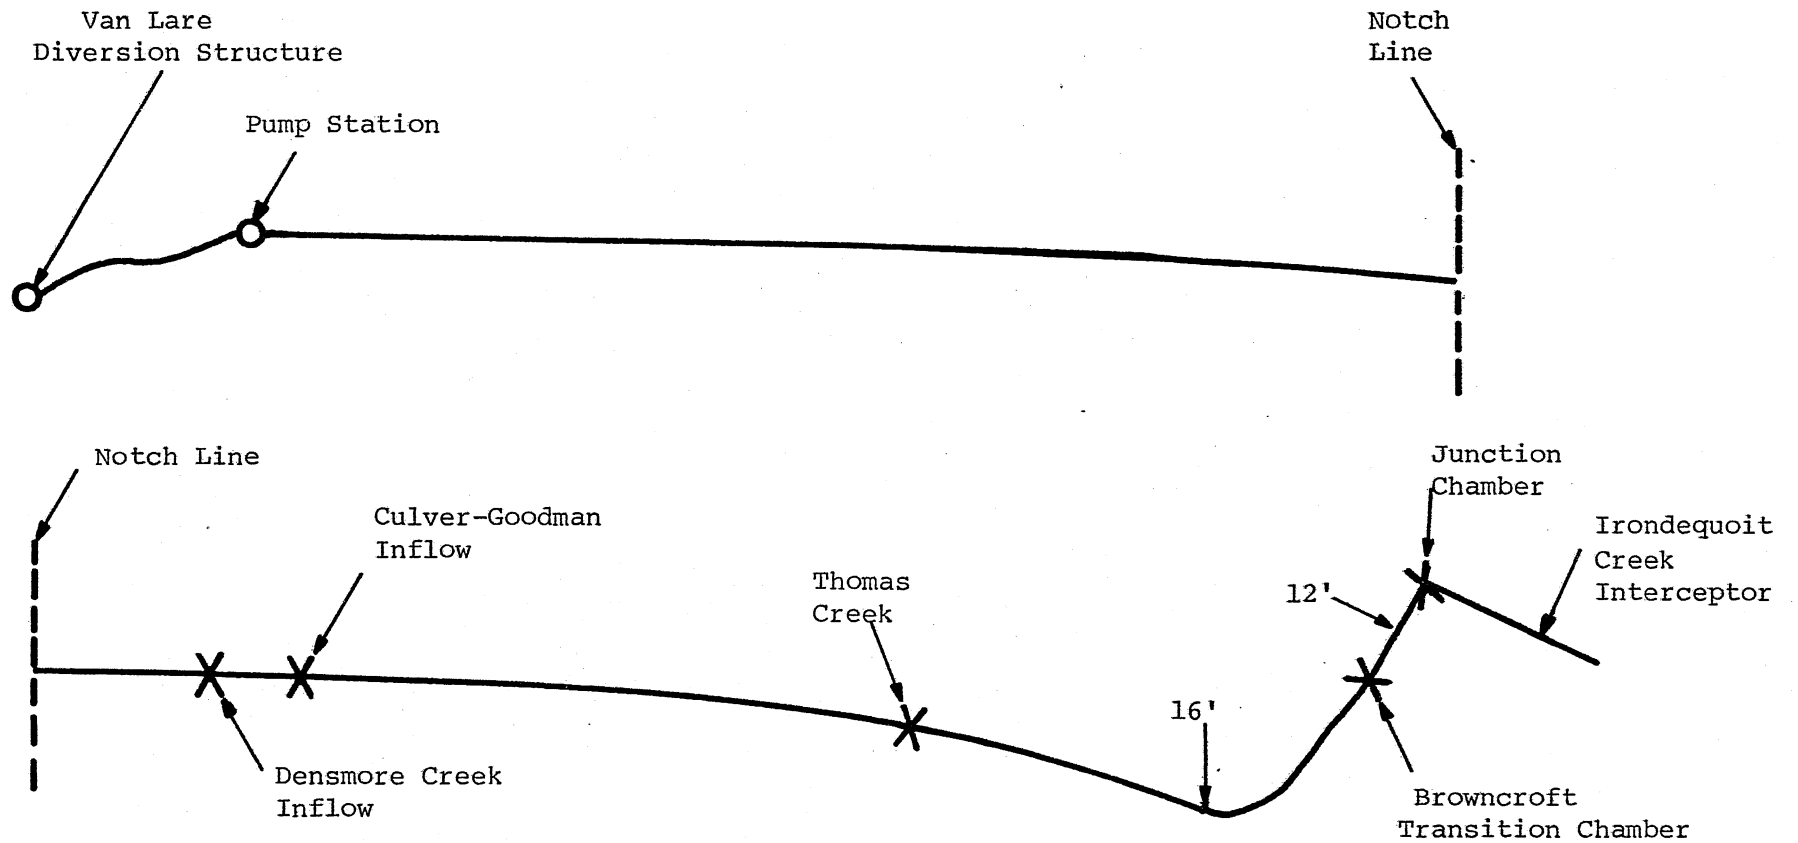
The General Layout of the Cross-Irondequoit Tunnel
